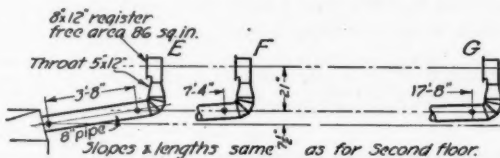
DETAILS OF FIRST STORY PIPES TESTED
